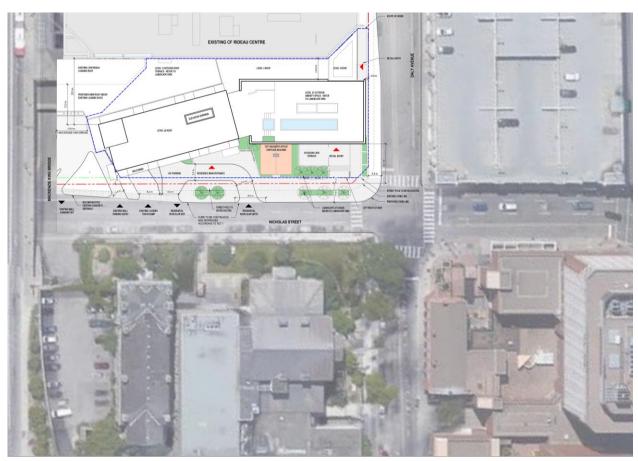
Illustrating the integration of the new development within the context of the Judicial District include alignment with the Courthouse's Nicholas Street entrance widen sidewalk and street trees use of limestone faced retaining walls and creating a public realm to support the activities of the Arts community. Source: CSW Landscape Architects 2022.
